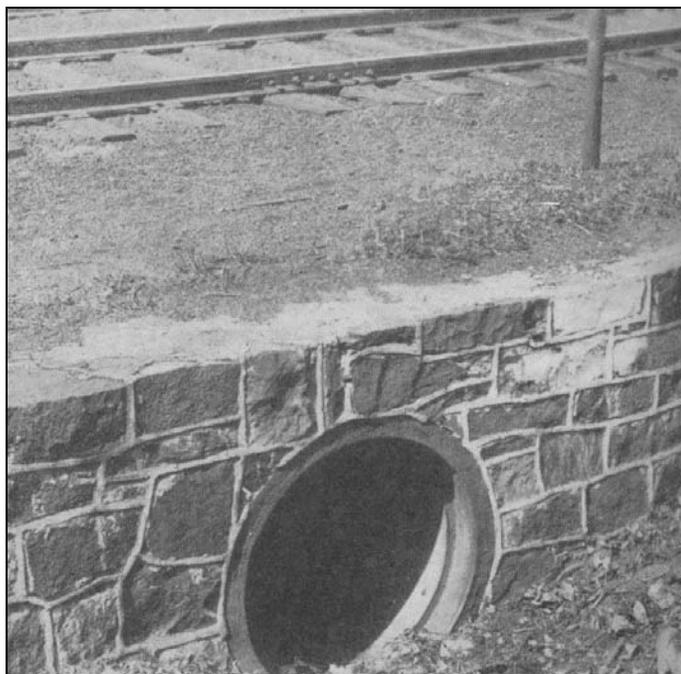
Cast-iron and masonry pipe culvert (Howson 1926:448)
